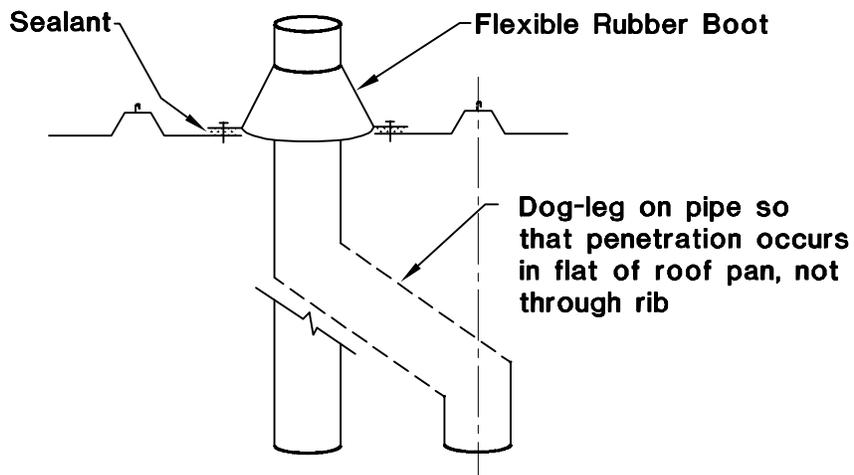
Pipe Penetration Boot for Standing Seam Roof Panel
